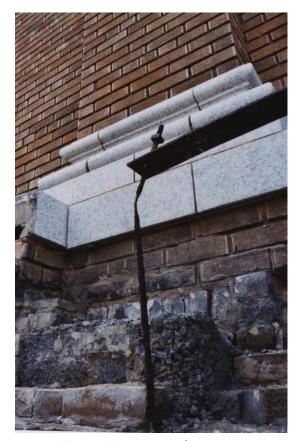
Balcony Bay 1 (south end) showing steel support plate and top of embedded vertical rod anchor for terra cotta baluster top rail.
